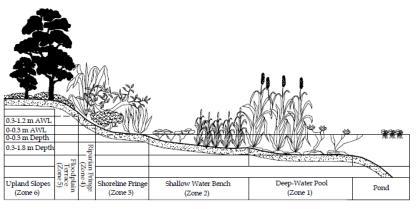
Planting zones for typical pond or wetland (Source: DID, 2012)
